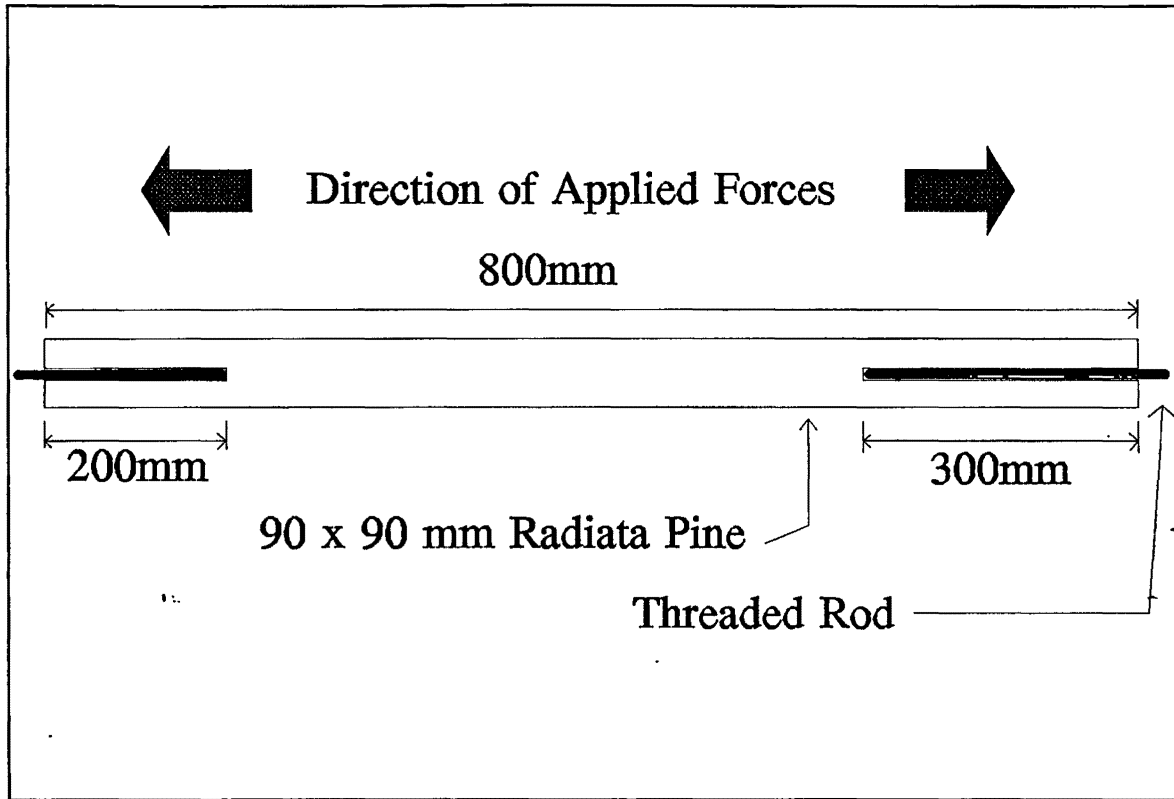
Tension Test Specimen With Epoxy Rod Connection at Each End.
